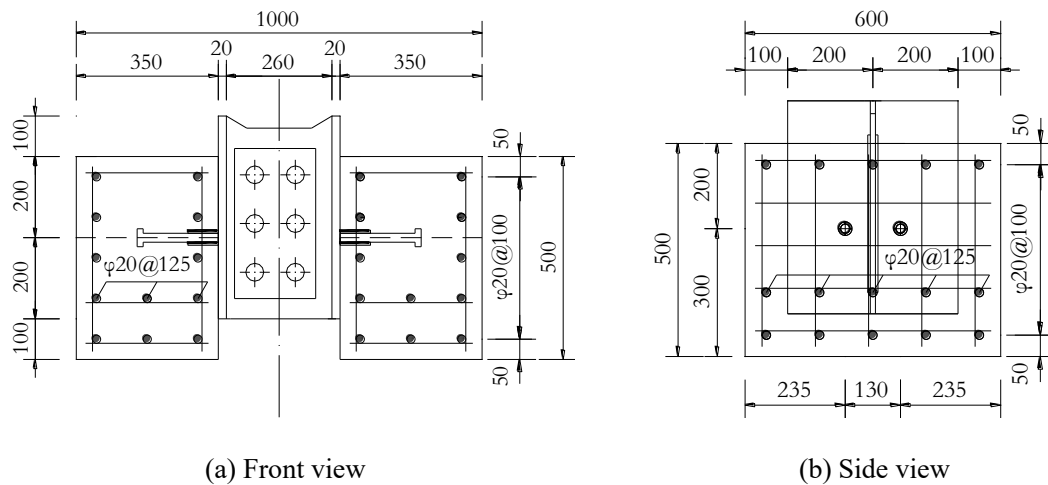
shows the specimen and the reinforcement layout. The steel beam was assembled by two T-shape steel components, of which the flange and web thicknesses were 20mm and 12mm. Two studs were welded on each of the steel flanges and embedded in the reinforced concrete slab, which means each push-out test included four studs in all. The stud spacing was 130 mm, and the stud diameter and height were 22mm and 220mm respectively. Reinforcement in the concrete blocks adopted HRB400, of which the diameter was 20mm. Thickness of the protective layer of reinforcement was 50mm.
